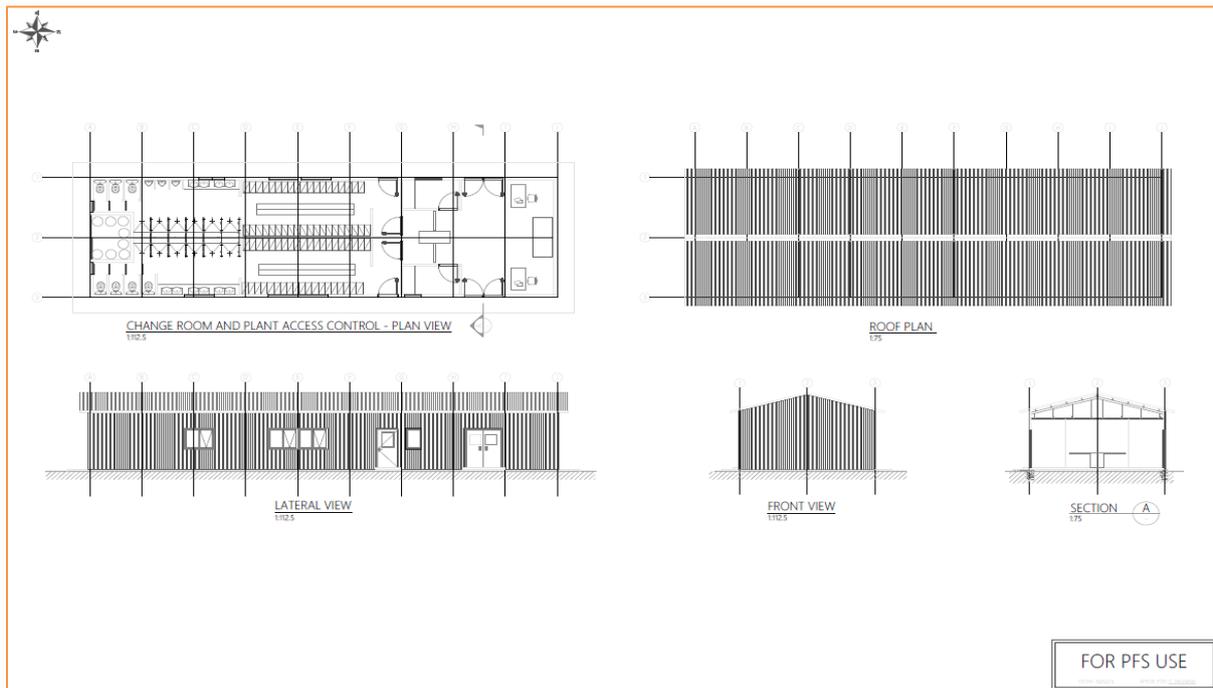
Typical Lay-Out of Plant Access Control and Change and Locker Rooms
